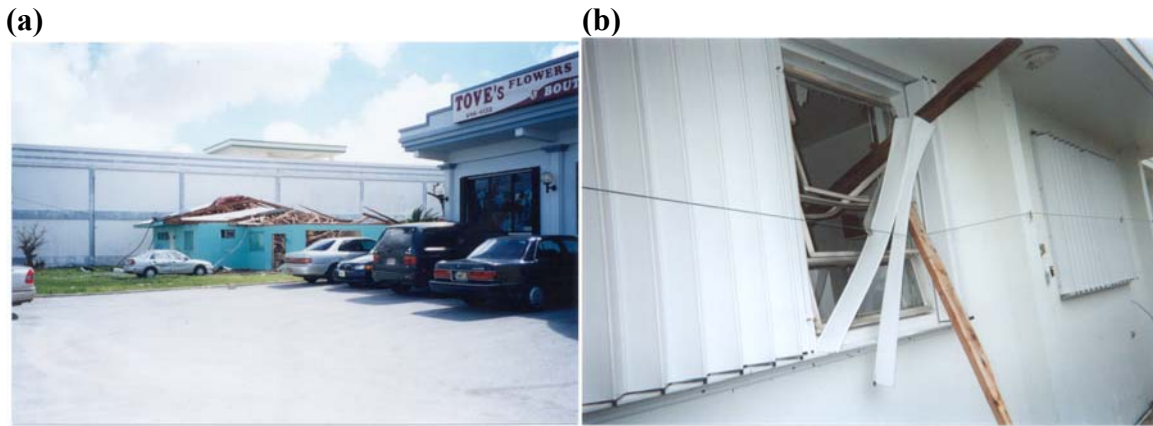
(a) Concrete buildings held up well except for the loss of doors and windows. Wooden buildings sandwiched between concrete buildings did not fare so well. (NOAA Photo) (b) While storm shutters played a very important role in reducing water damage in buildings, they occasionally were victims of flying debris. (Photo by Carman Lujan)
